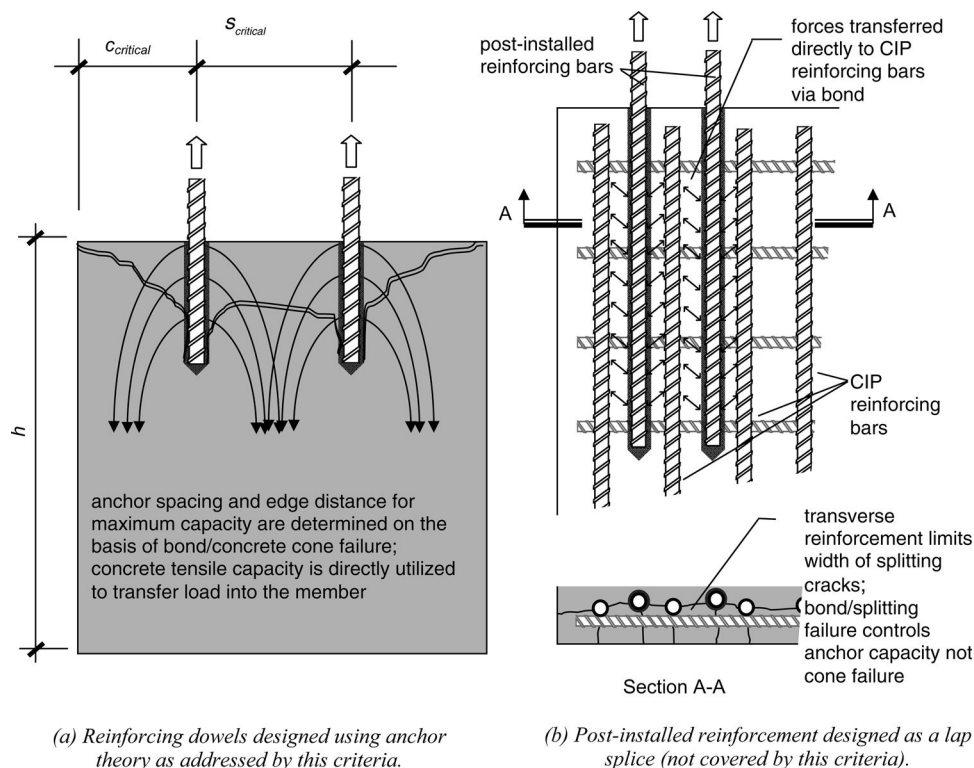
Examples of post-installed reinforcing bars proportioned with anchor theory and with concepts of reinforcement development and splicing.
